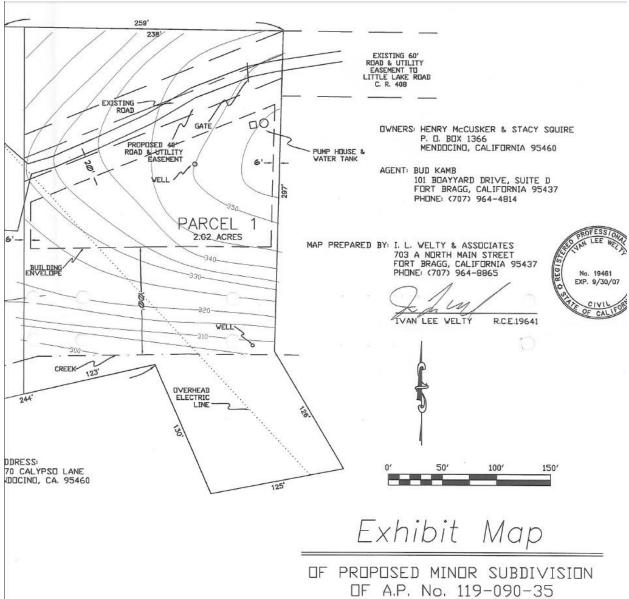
Building envelope and road and utility easement as shown on the subdivision map.
